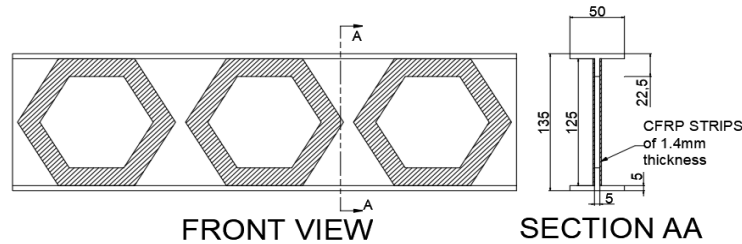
Provision of CFRP Stiffeners to castellated beam along the edge of opening
